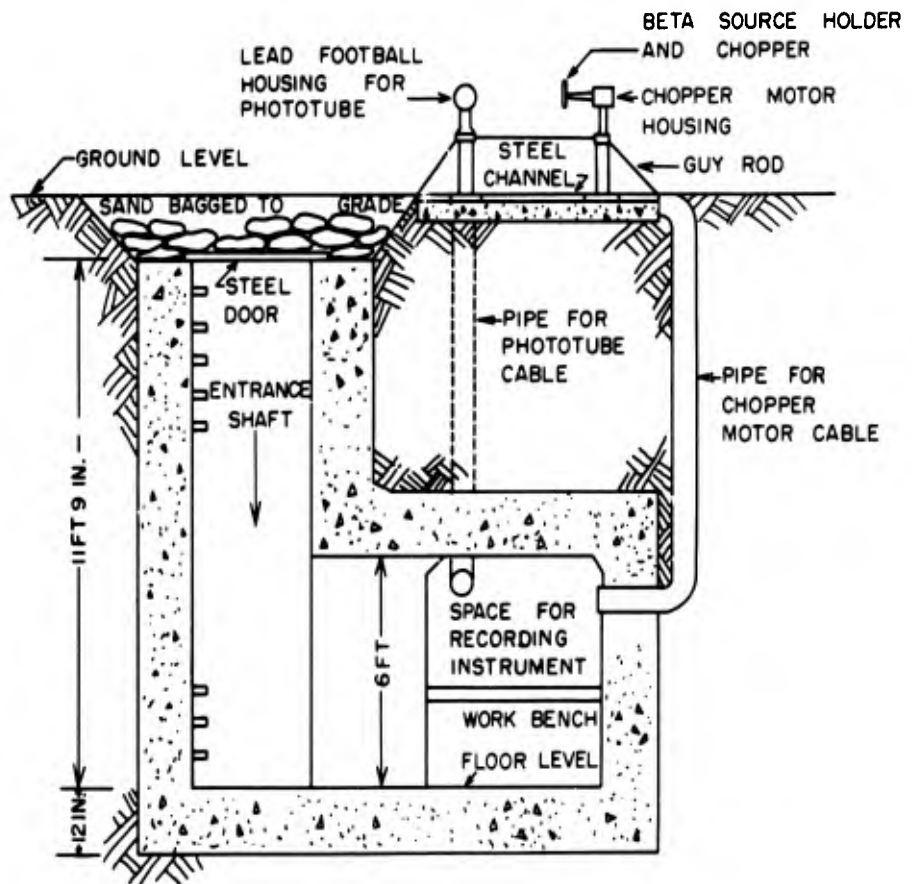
Instrument shelter and general instrumentation layout of Station 620.
